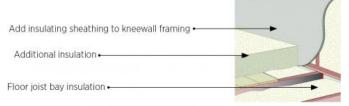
Cover insulated kneewall with rigid foam, caulked at edges. Add attic floor insulation 🕮 🗗
